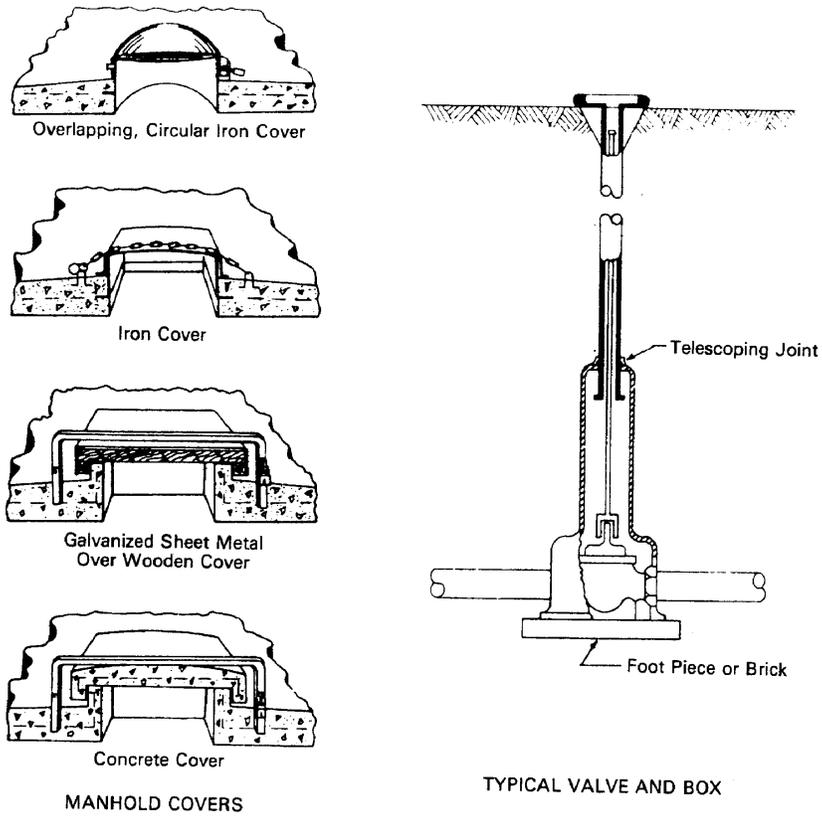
Typical Valve and Box, Manhole Covers, and Piping Installation
